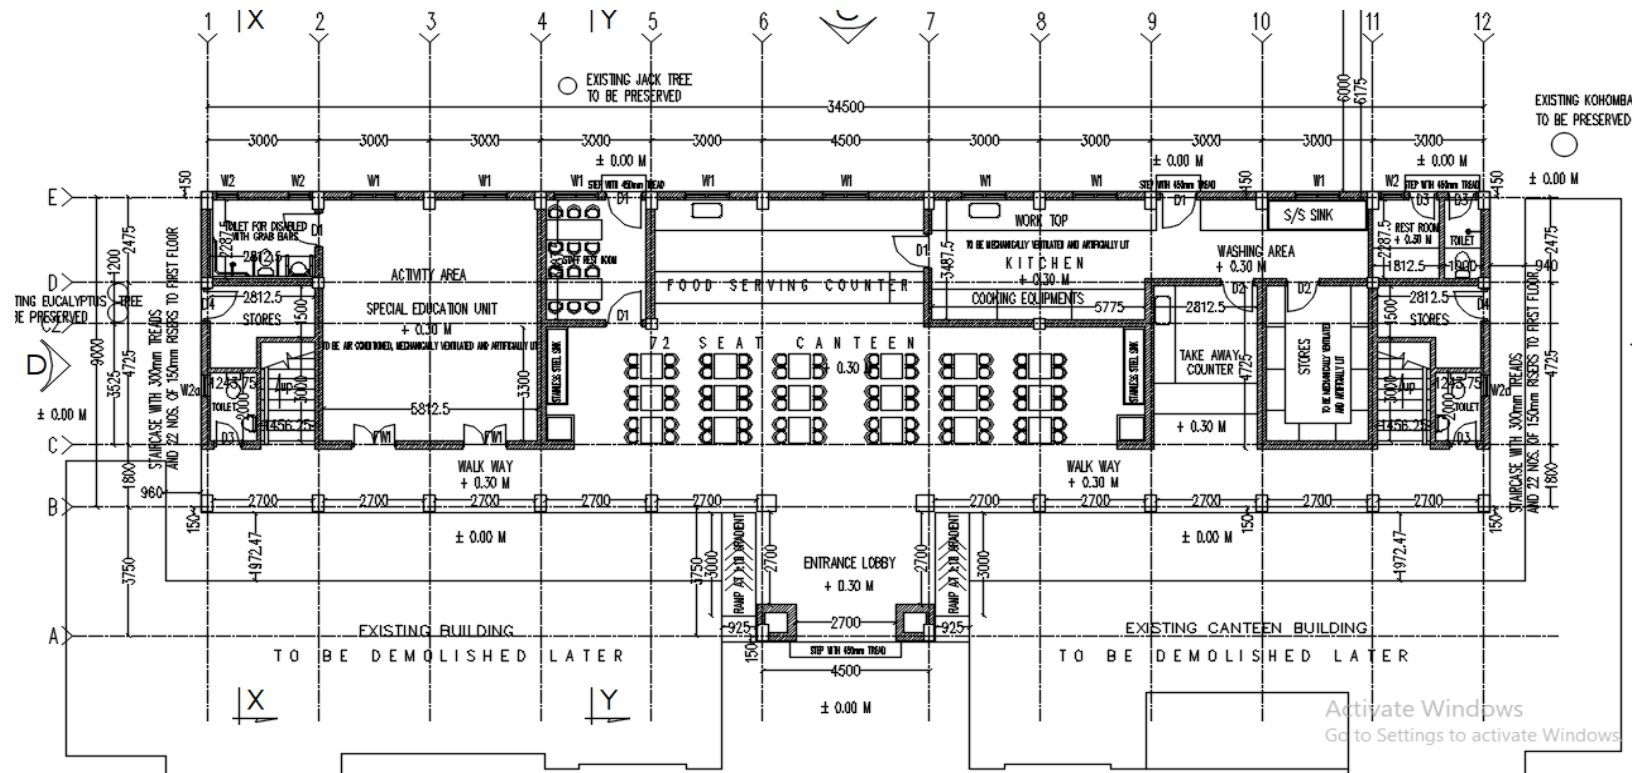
Ground floor plan – Mahanama college, Colombo 03.
